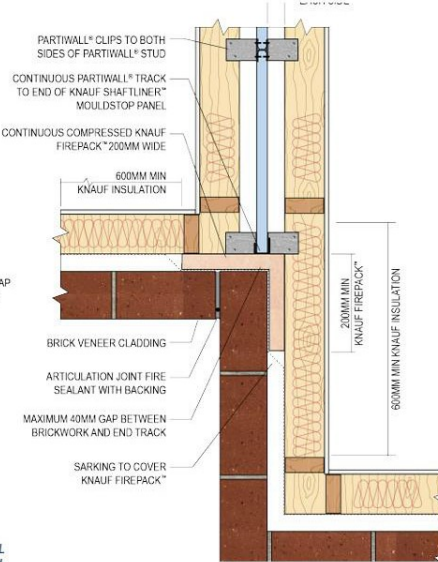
Brick Veneer Wall Junction 2 – Plan view
